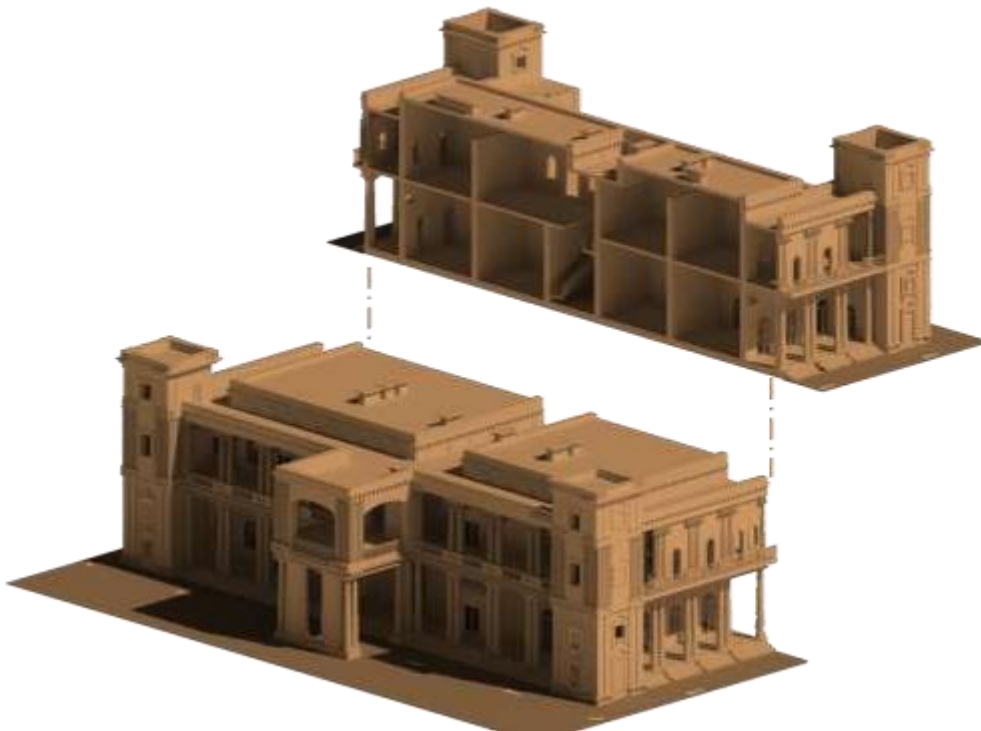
Elevations and 3D sectional view, Poonch House, Lahore
